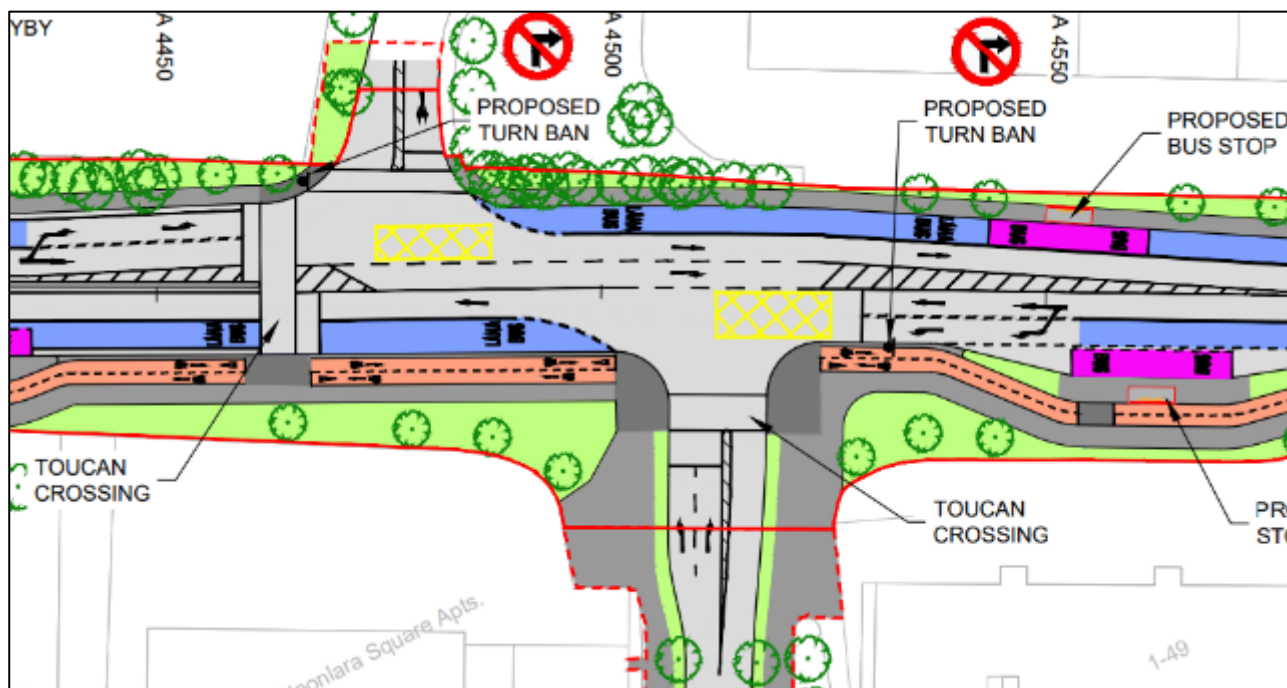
Navan Road / Phoenix Park Avenue Junction
